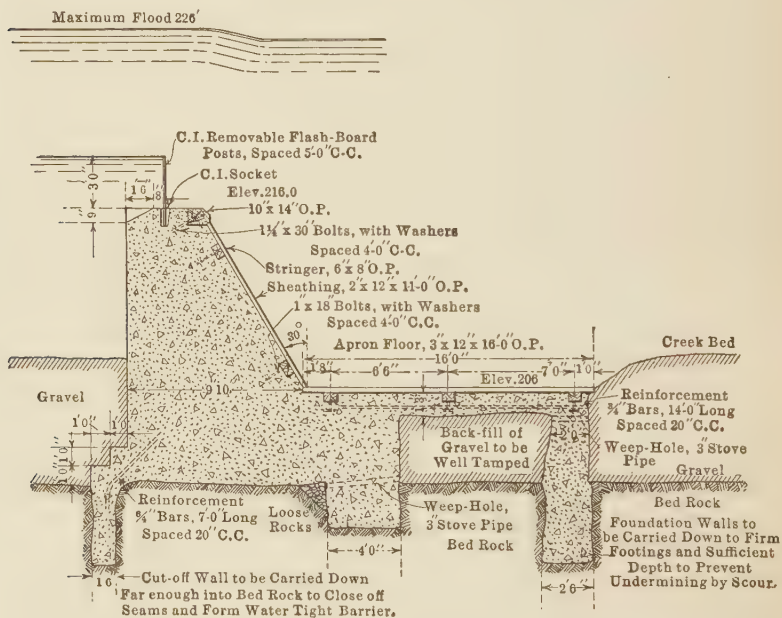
Cross section of Capay diversion weir. Yolo Water & Power Co. Calif.
